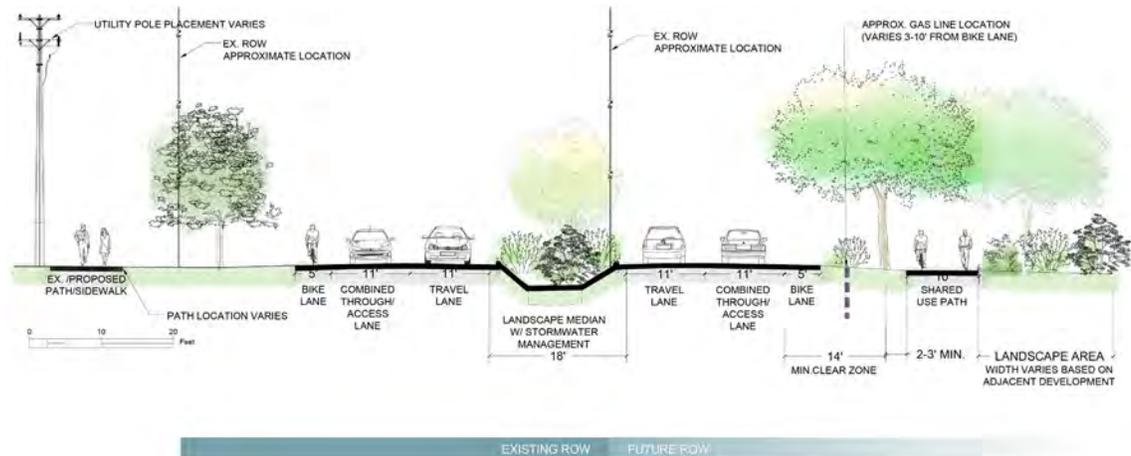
Open median drainage between Clay and South Atlantic with street trees along roadside and trail behind
